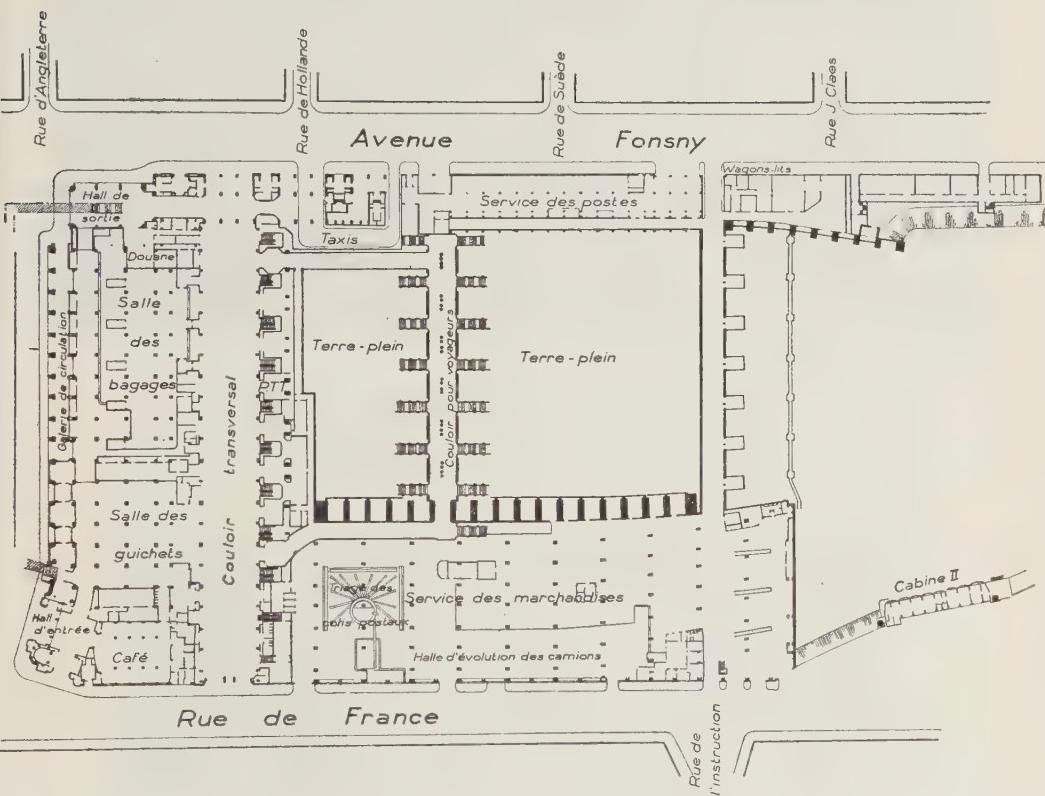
Brussels Midi. — Plan of the ground floor.
